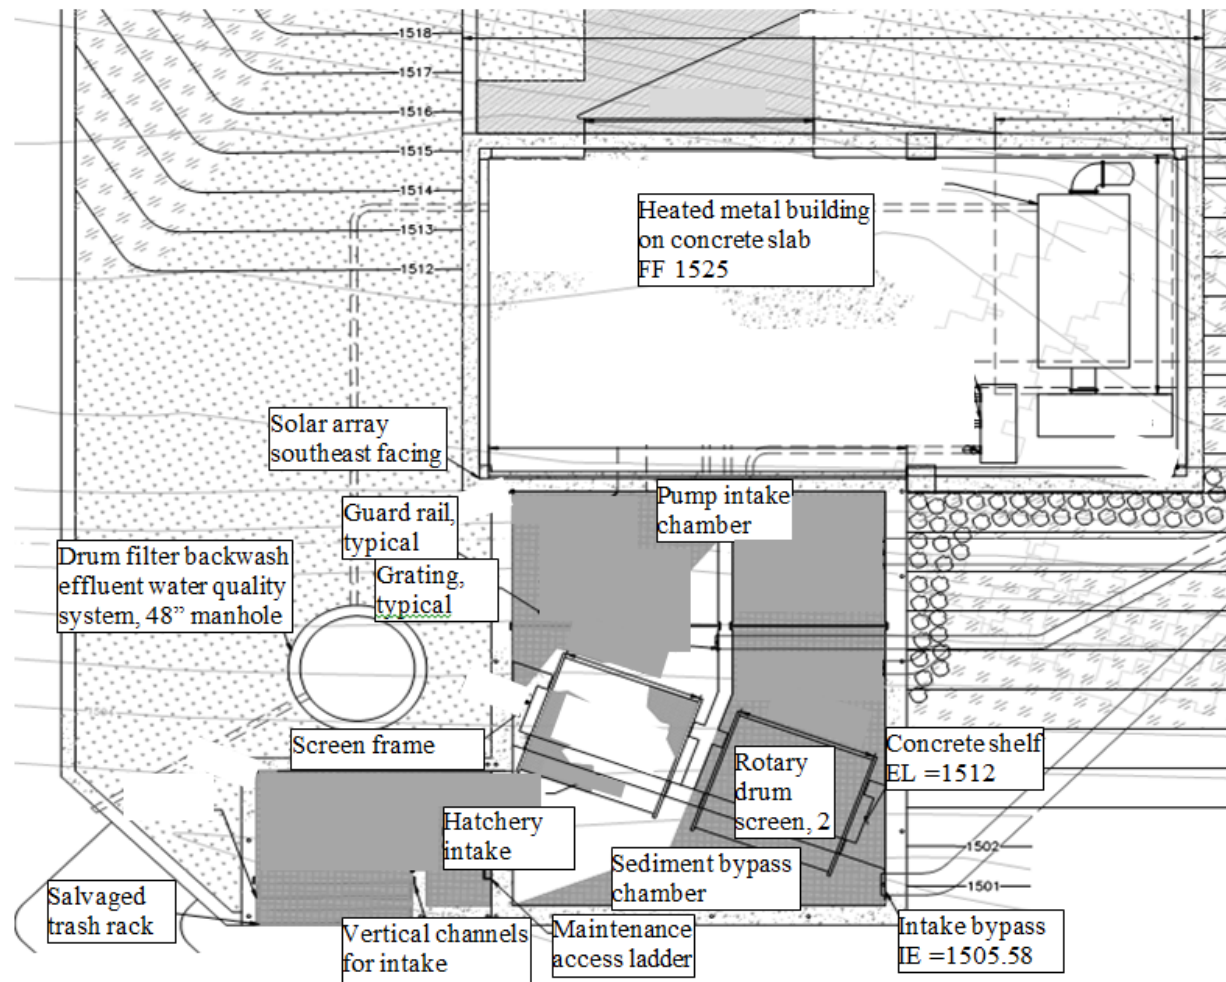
Concept 3 intake site plan at new intake location (Bennett, C. and Kingsley, S., 2013).
